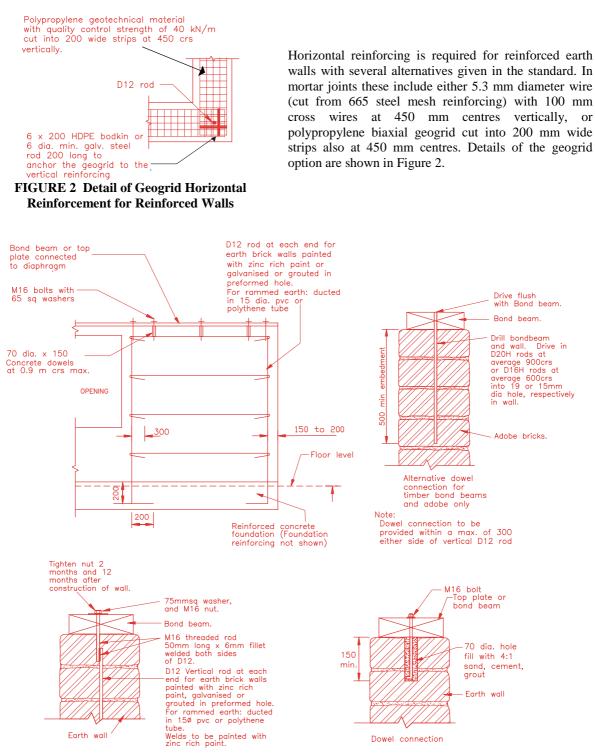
Reinforcing and Dowel Connections for Reinforced Walls
